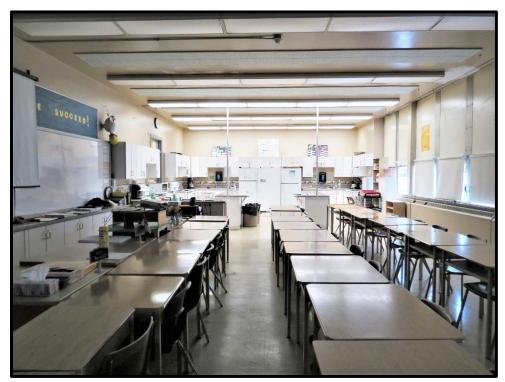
Second Floor Classroom - West Wing (Photo taken on March 13, 2019)
